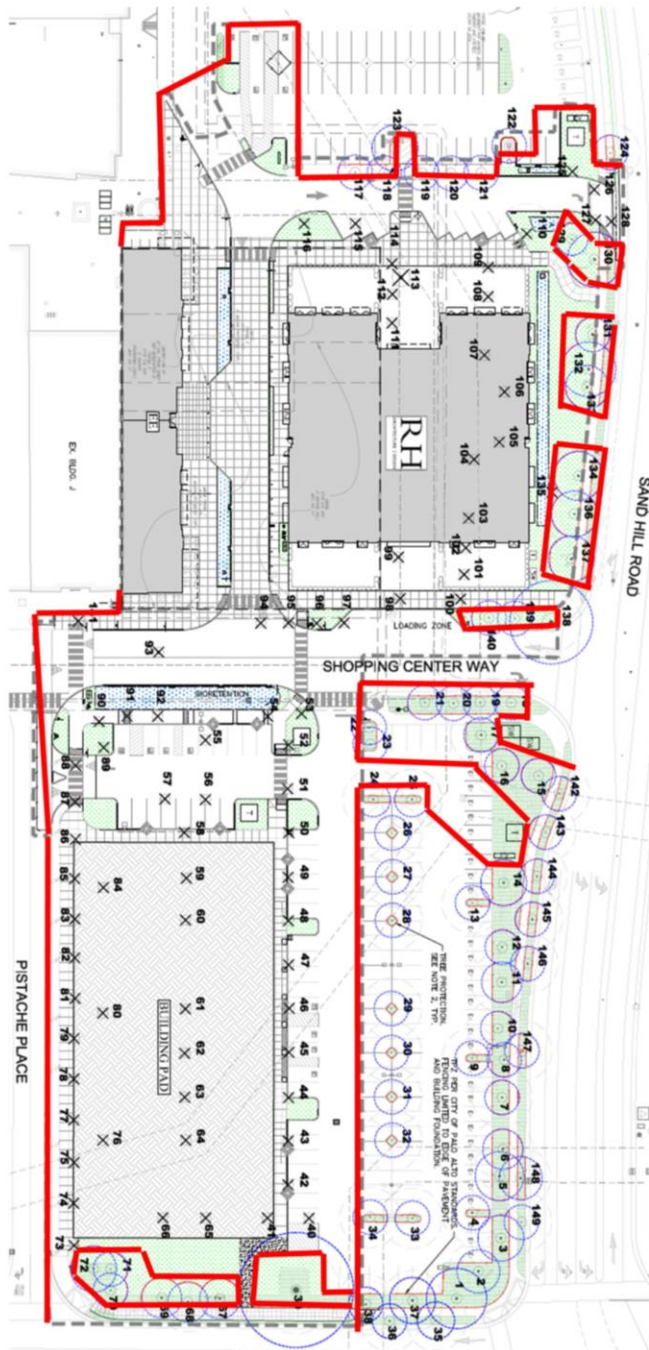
Tree Protection Fencing (red) shall protect the dripline of each tree up to the perimeter fence or edge of construction.
